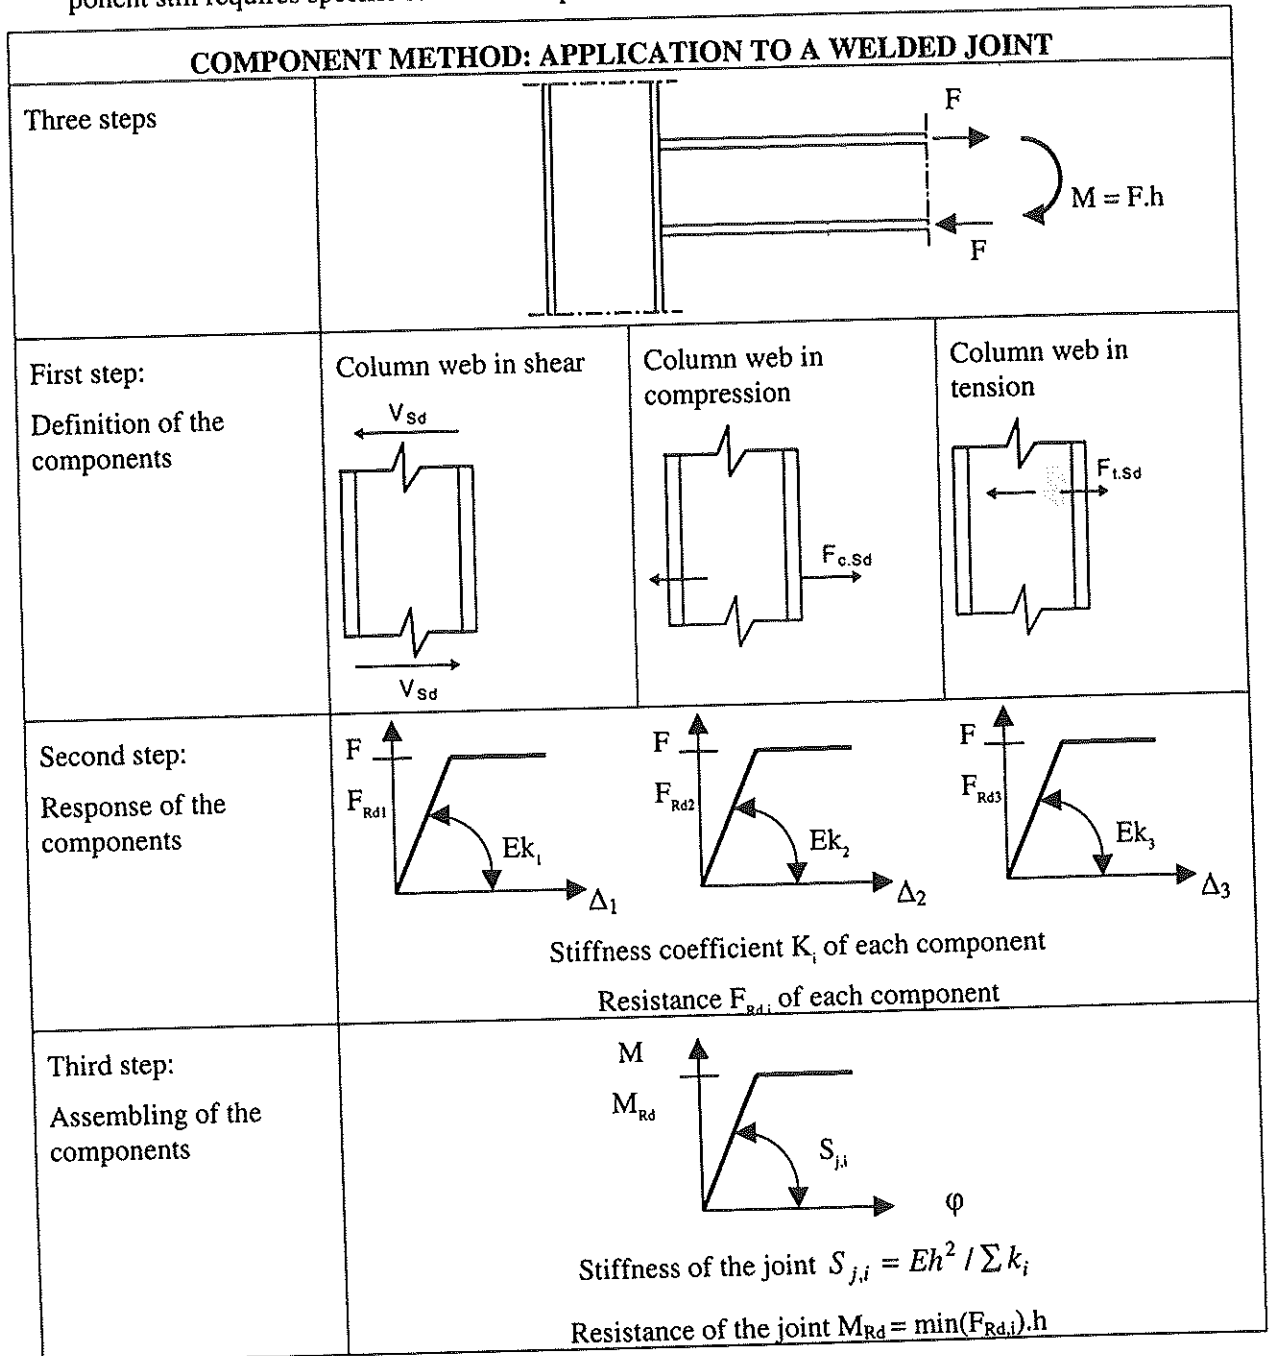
Application of the component method to a steel welded joint.
